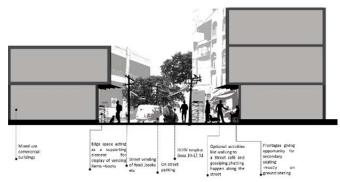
Typical Traditional Street of Avenue Road (Source: Author)
